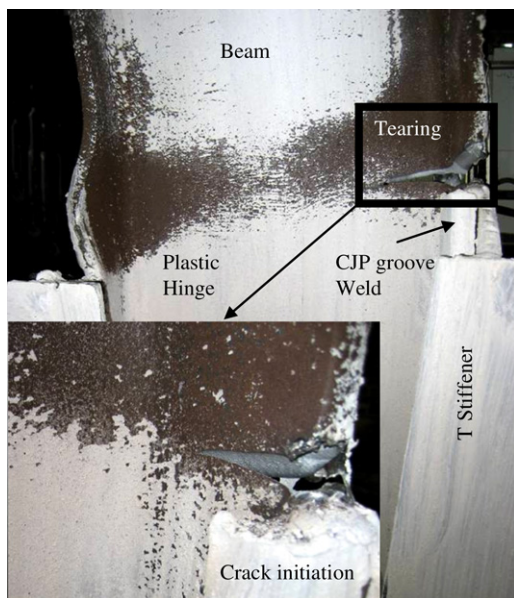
Observed failure mode in the retrofitted connection with T-stiffener utilizing CJP groove weld to join the horizontal element to the beam flange.
